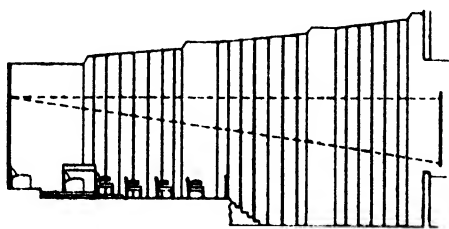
ELEVATION OF A REVIEW ROOM (M.G.M. ELSTREE STUDIOS)
